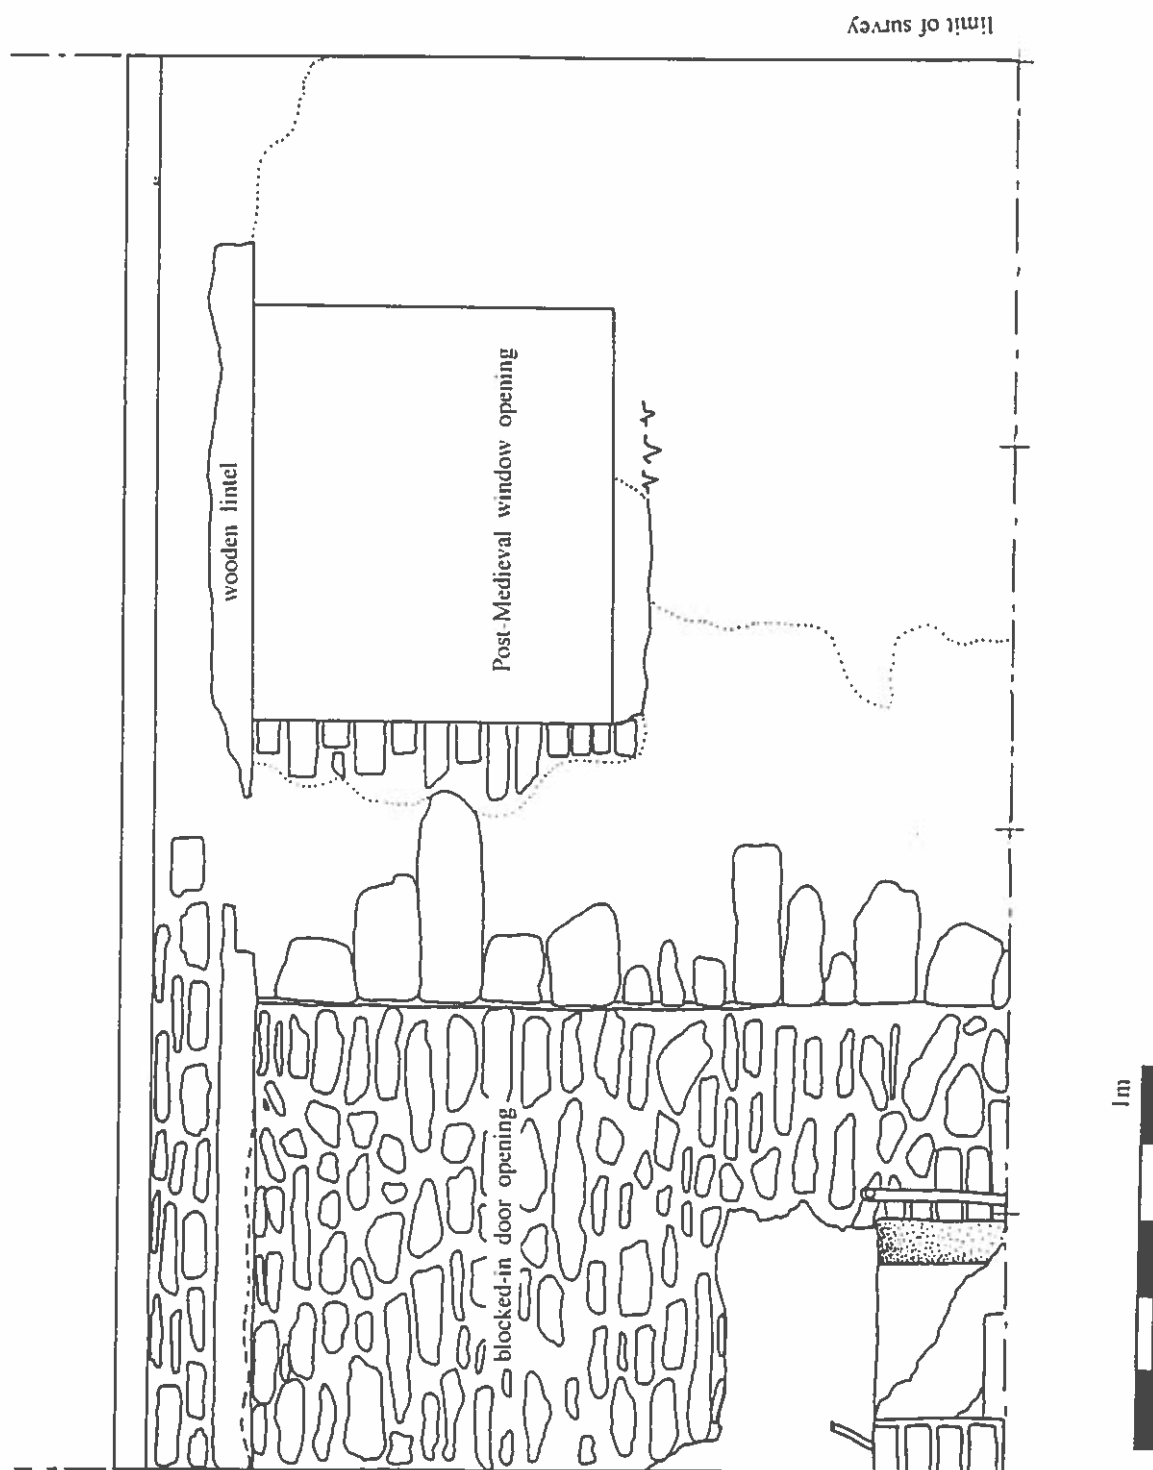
AREA C: NORTH-FACING INTERNAL ELEVATION AND FIREPLACE
